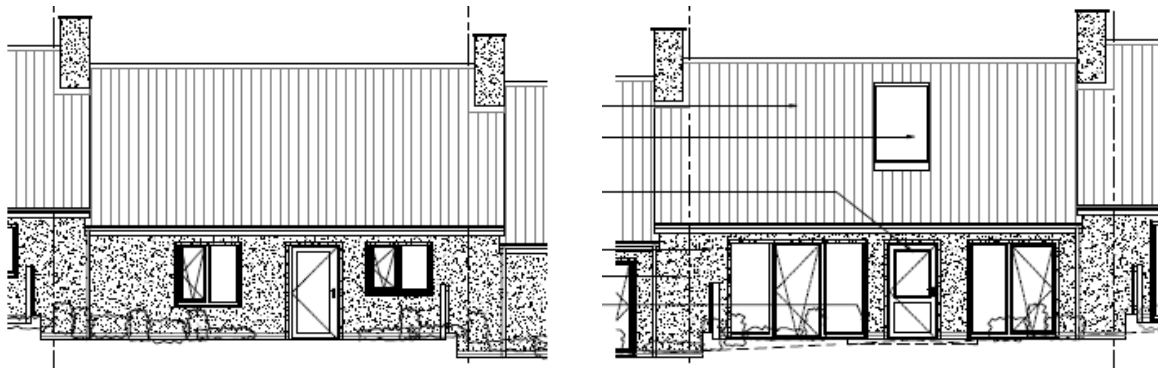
North and South elevation of dwelling 2. Dwelling 1 is very similar, apart from the fact that it is an end-terrace.
